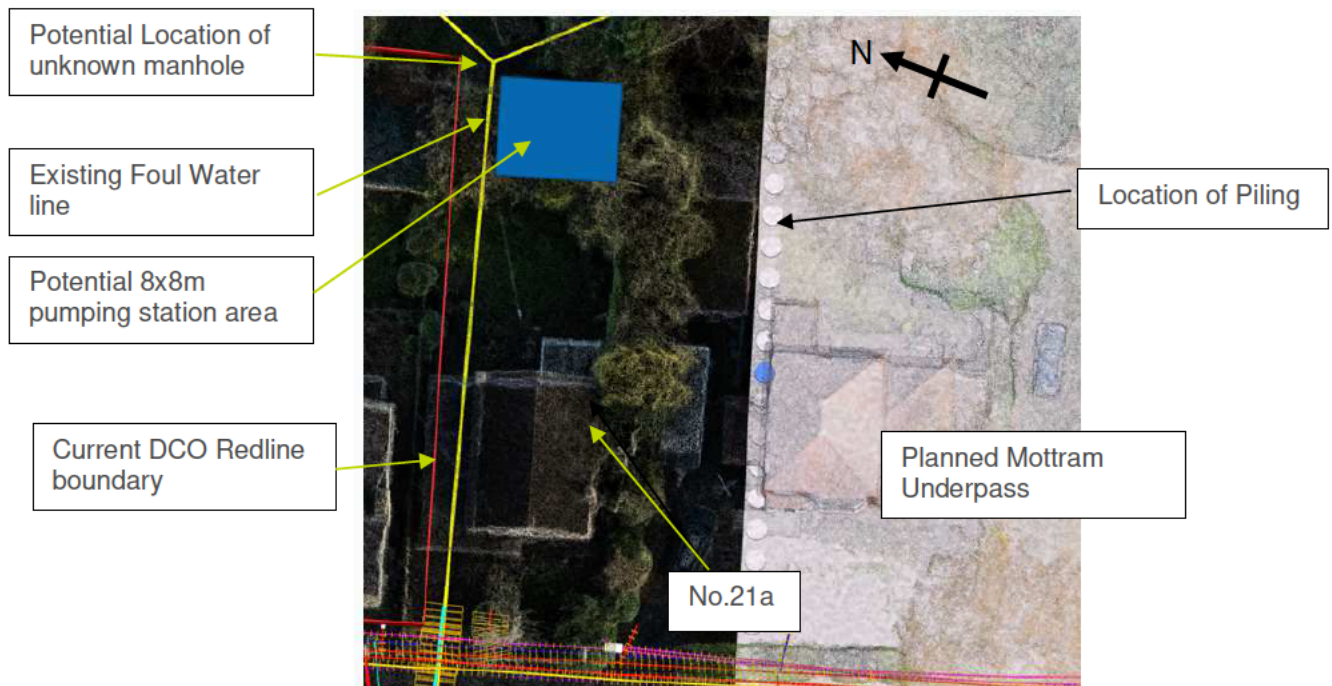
Foul Water Layout around No. 21a Old Road
